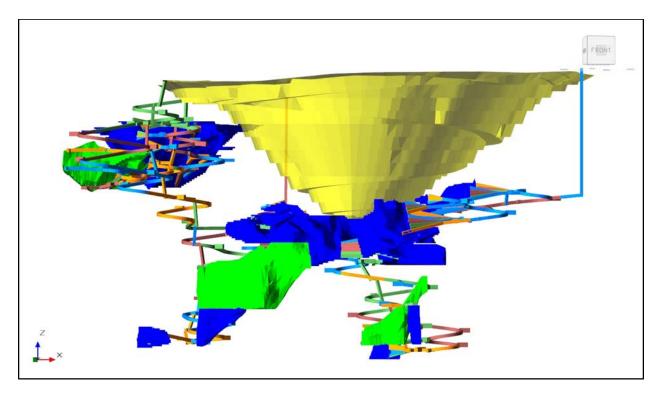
UNDERGROUND MINE AT END OF LOM, 3-D SCHEMATIC
